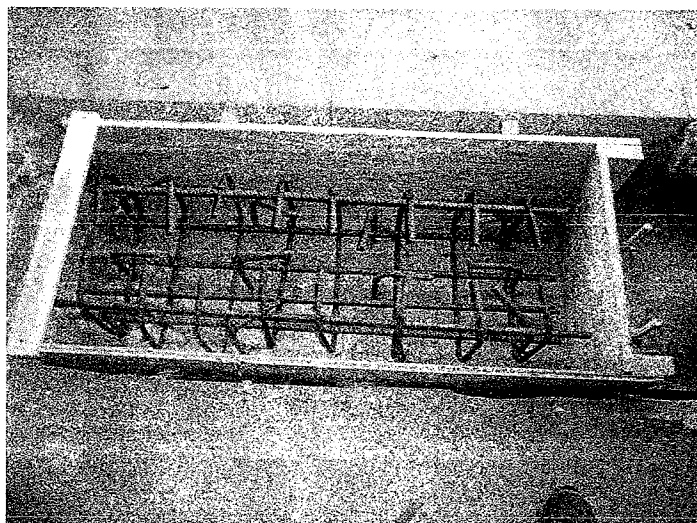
Preparation for Concrete Grade Beam at Grid A/2.9
